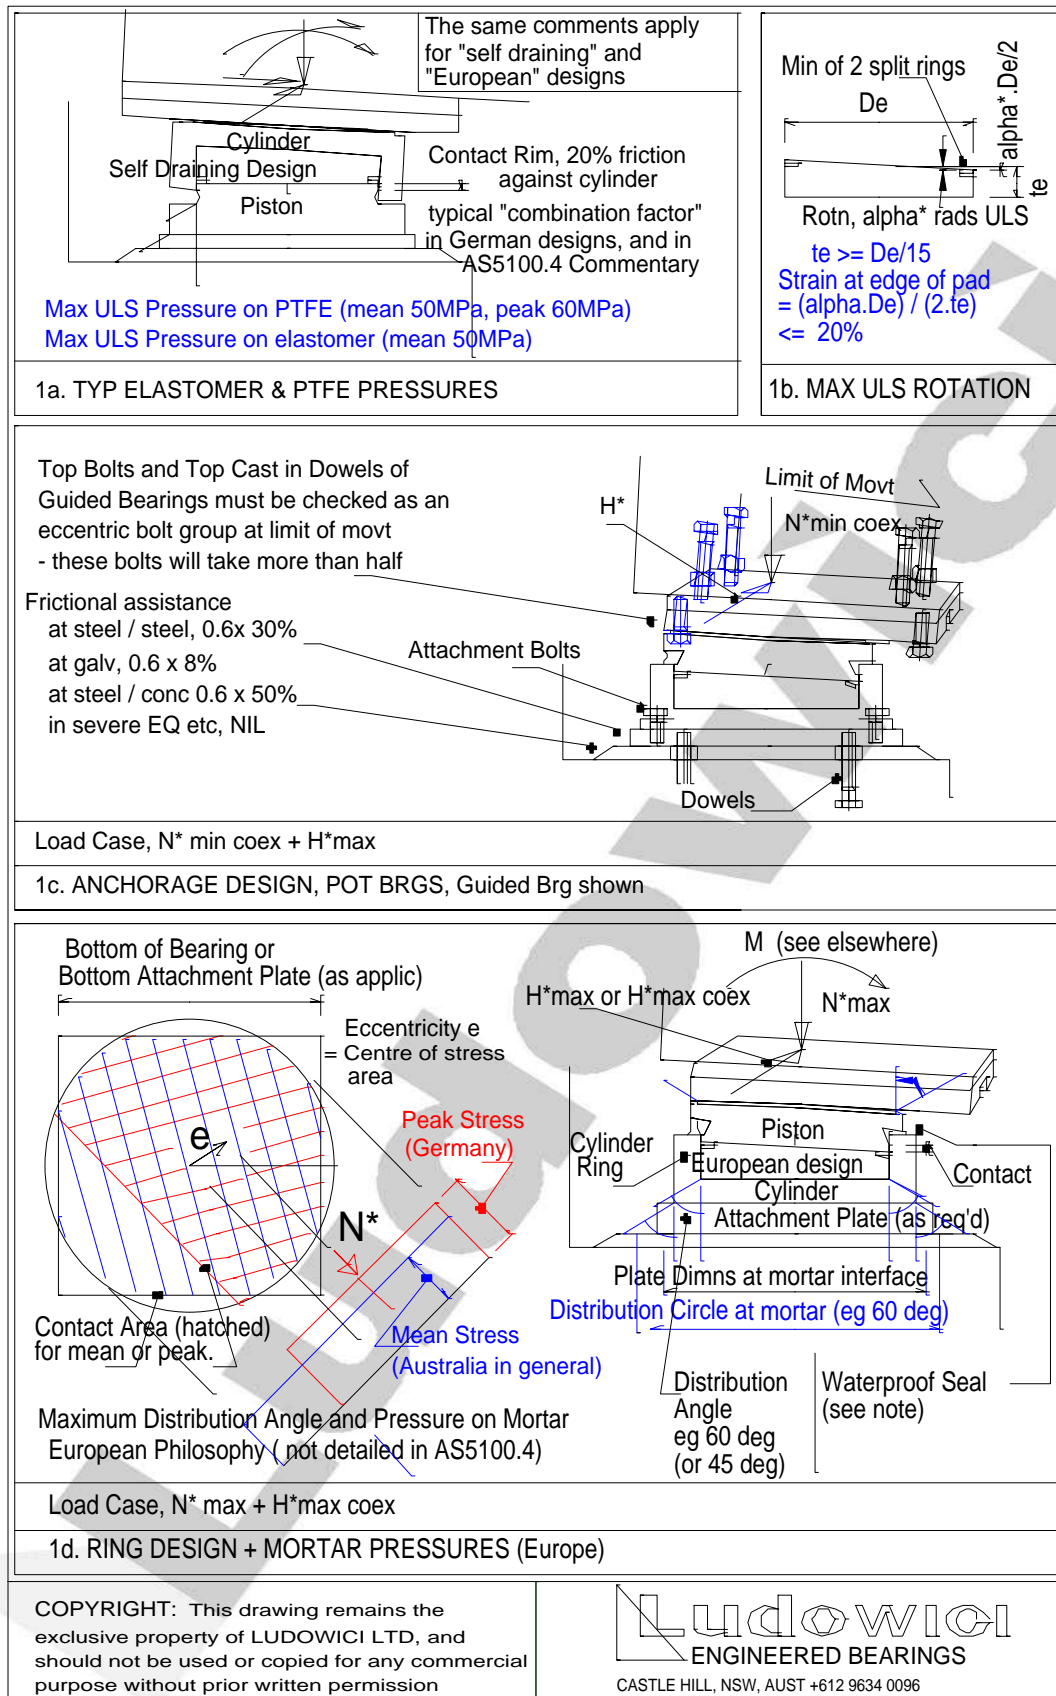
Design Checks for Pot Bearings; 1a.Elastomer and PTFE Pressures; 1b. Max Rotation; 1c. Anchorage Design; 1d. Ring Design and Mortar Pressures (Note that the waterproof seal in 1d. should arguably remain so for the full rotation range).
